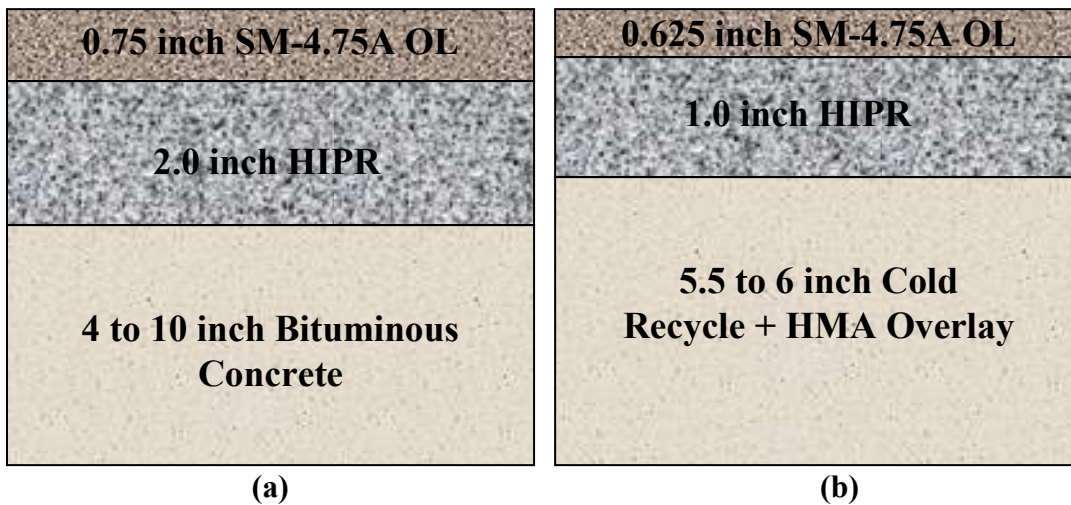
Pavement cross section of (a) US-160 and (b) K-25 project
